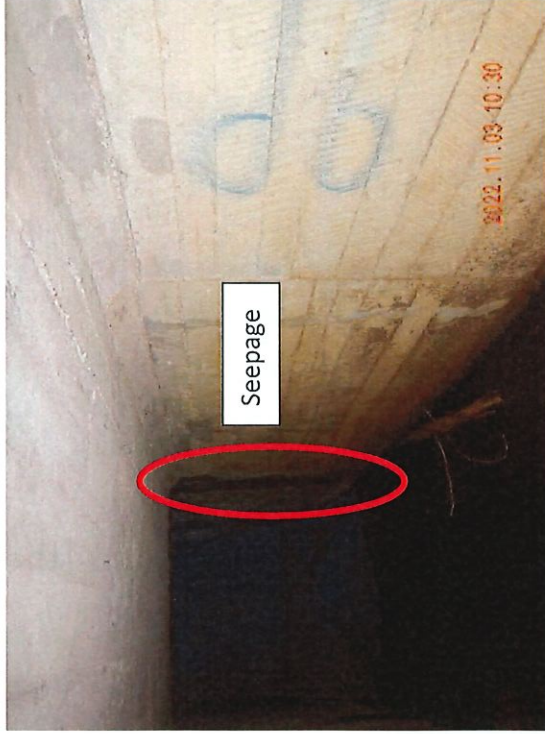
description: Seepage at Joint Between Right Riser Box and Left Box Spillway (Left Side)
